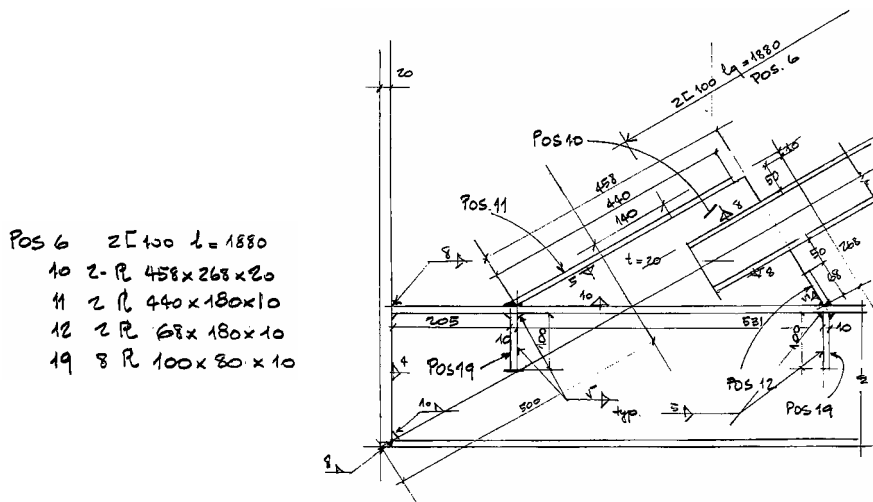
K-bracing and shear-link: detail of the bottom braces connection
